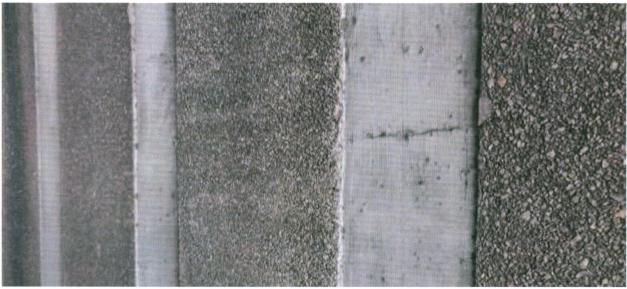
Example of imperfection in white concrete facing, possibly caused by a seam in the plywood formwork.
